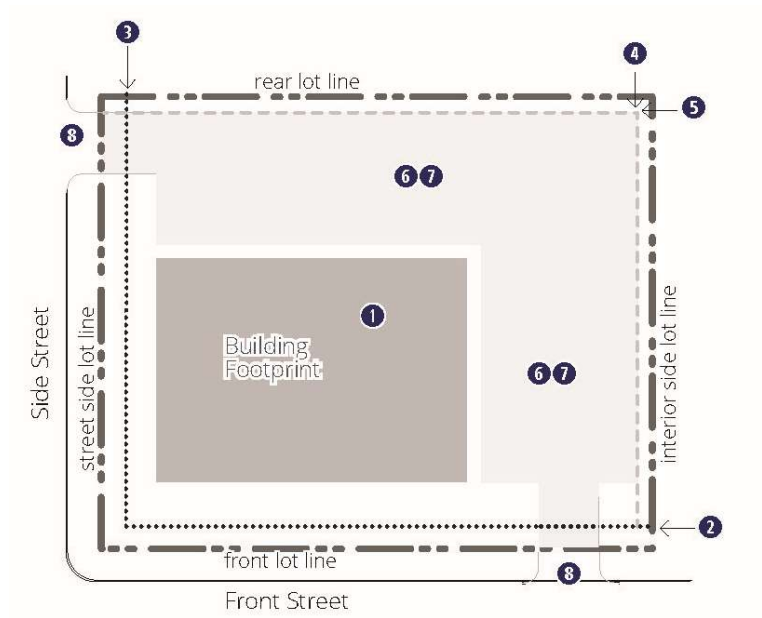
(1). C3 and CX district diagrammatic plans and elevations.
